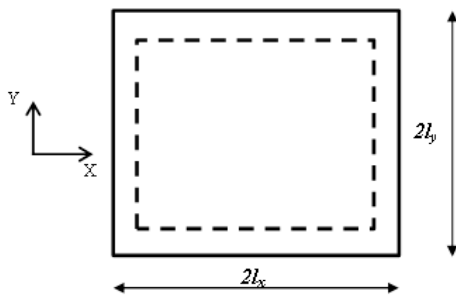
Plan view of the basement floor showing the crack as a dashed line.
